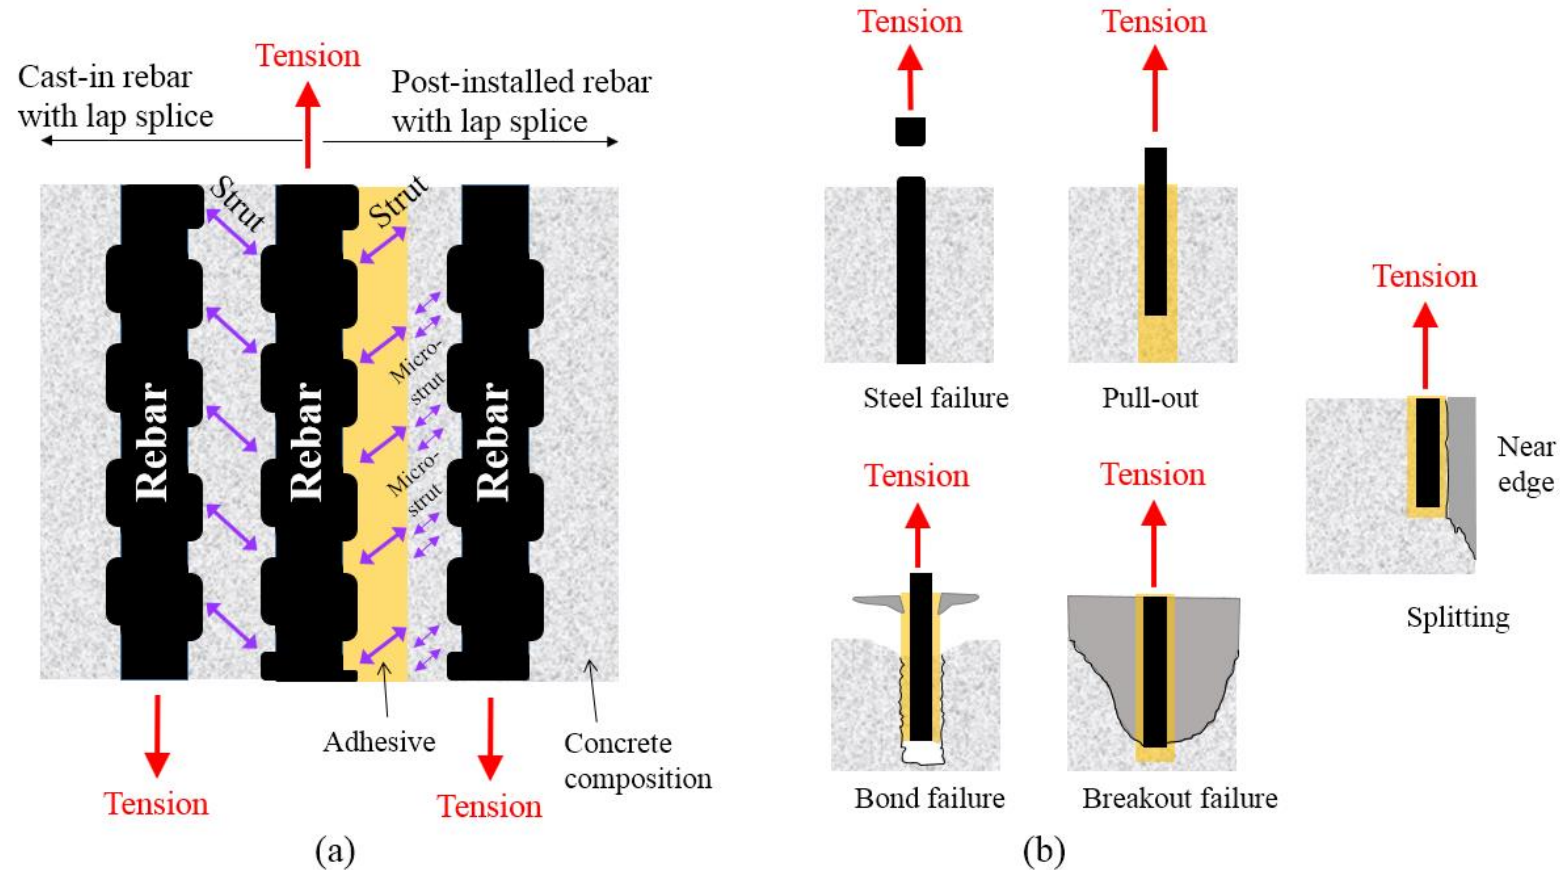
Load transfers mechanism (a) lap splices in cast-in and post-installed reinforcement (b) without lap splices, anchor-dominated failure modes
